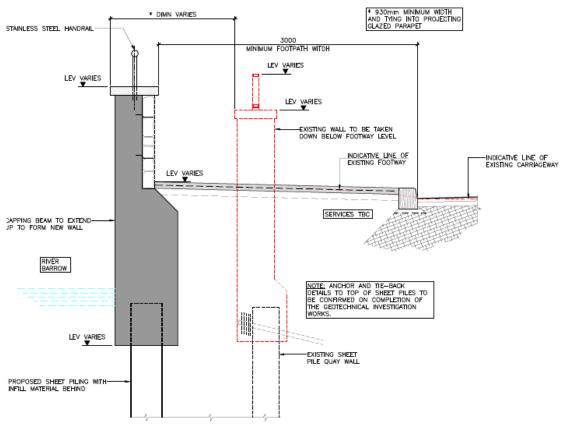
Cross Section of Proposed Southeast Quay Wall (existing in red)
